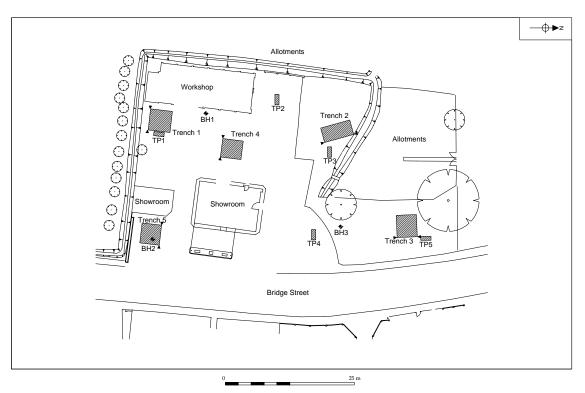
Plan of site showing location of trenches and boreholes. Scale 1:400
